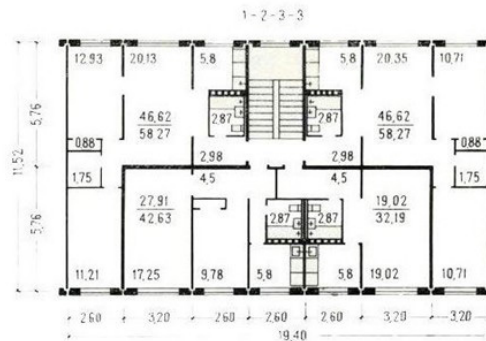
Floor plan for one section of a standard I-464 apartment building. Like I-447, multiple sections were joined to create larger apartment blocks, although these sections were not internally connected and could only be accessed via their own stairwell. Source: Metrkvadratny c.1960s.
